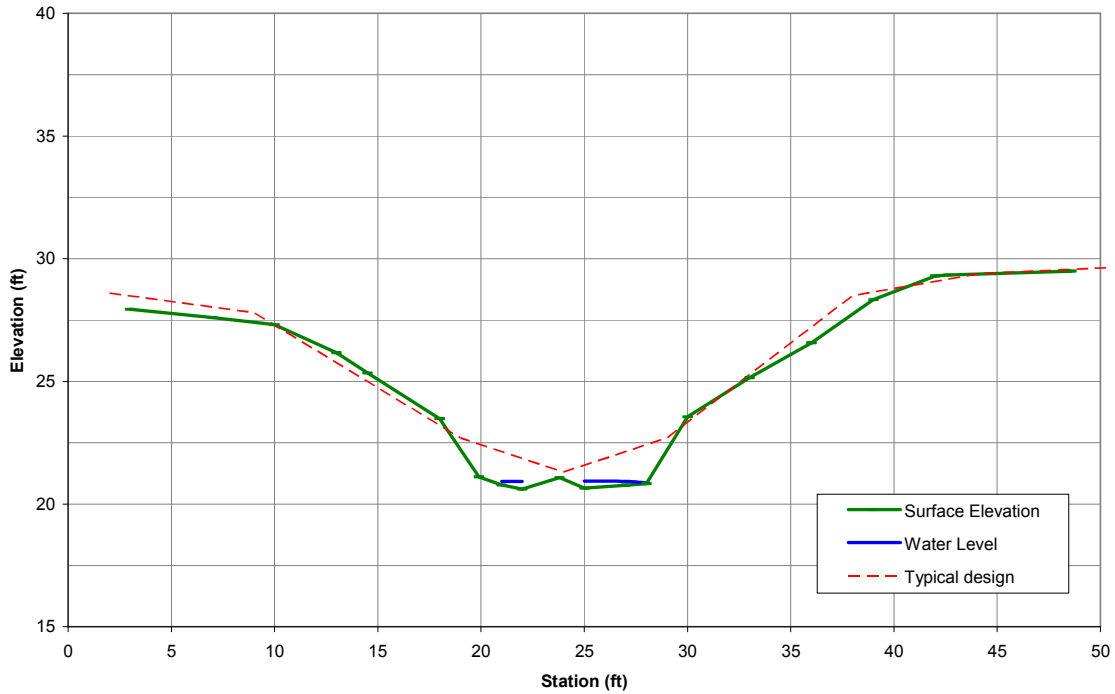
Cross Section C, STA 2+00 upstream from Kains Avenue culvert
